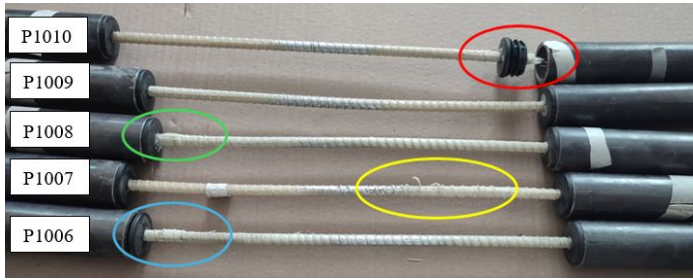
Damaged reinforcement bars with a diameter of 10 mm (samples P1006–P1010).
